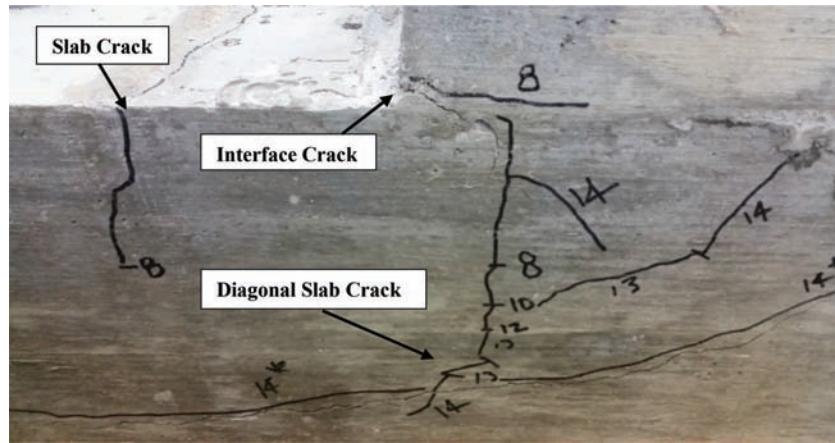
Strip Specimen 5 cracking at 14 kip.
